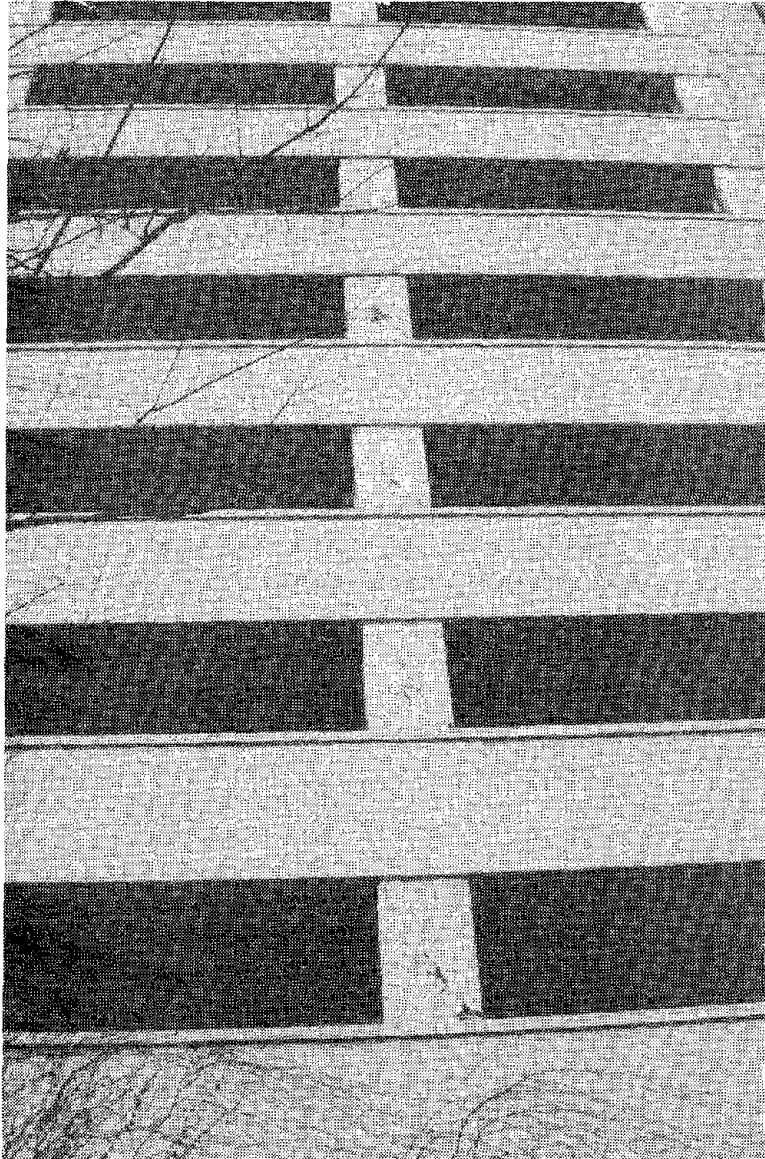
Damage to shear-critical reinforced concrete columns
